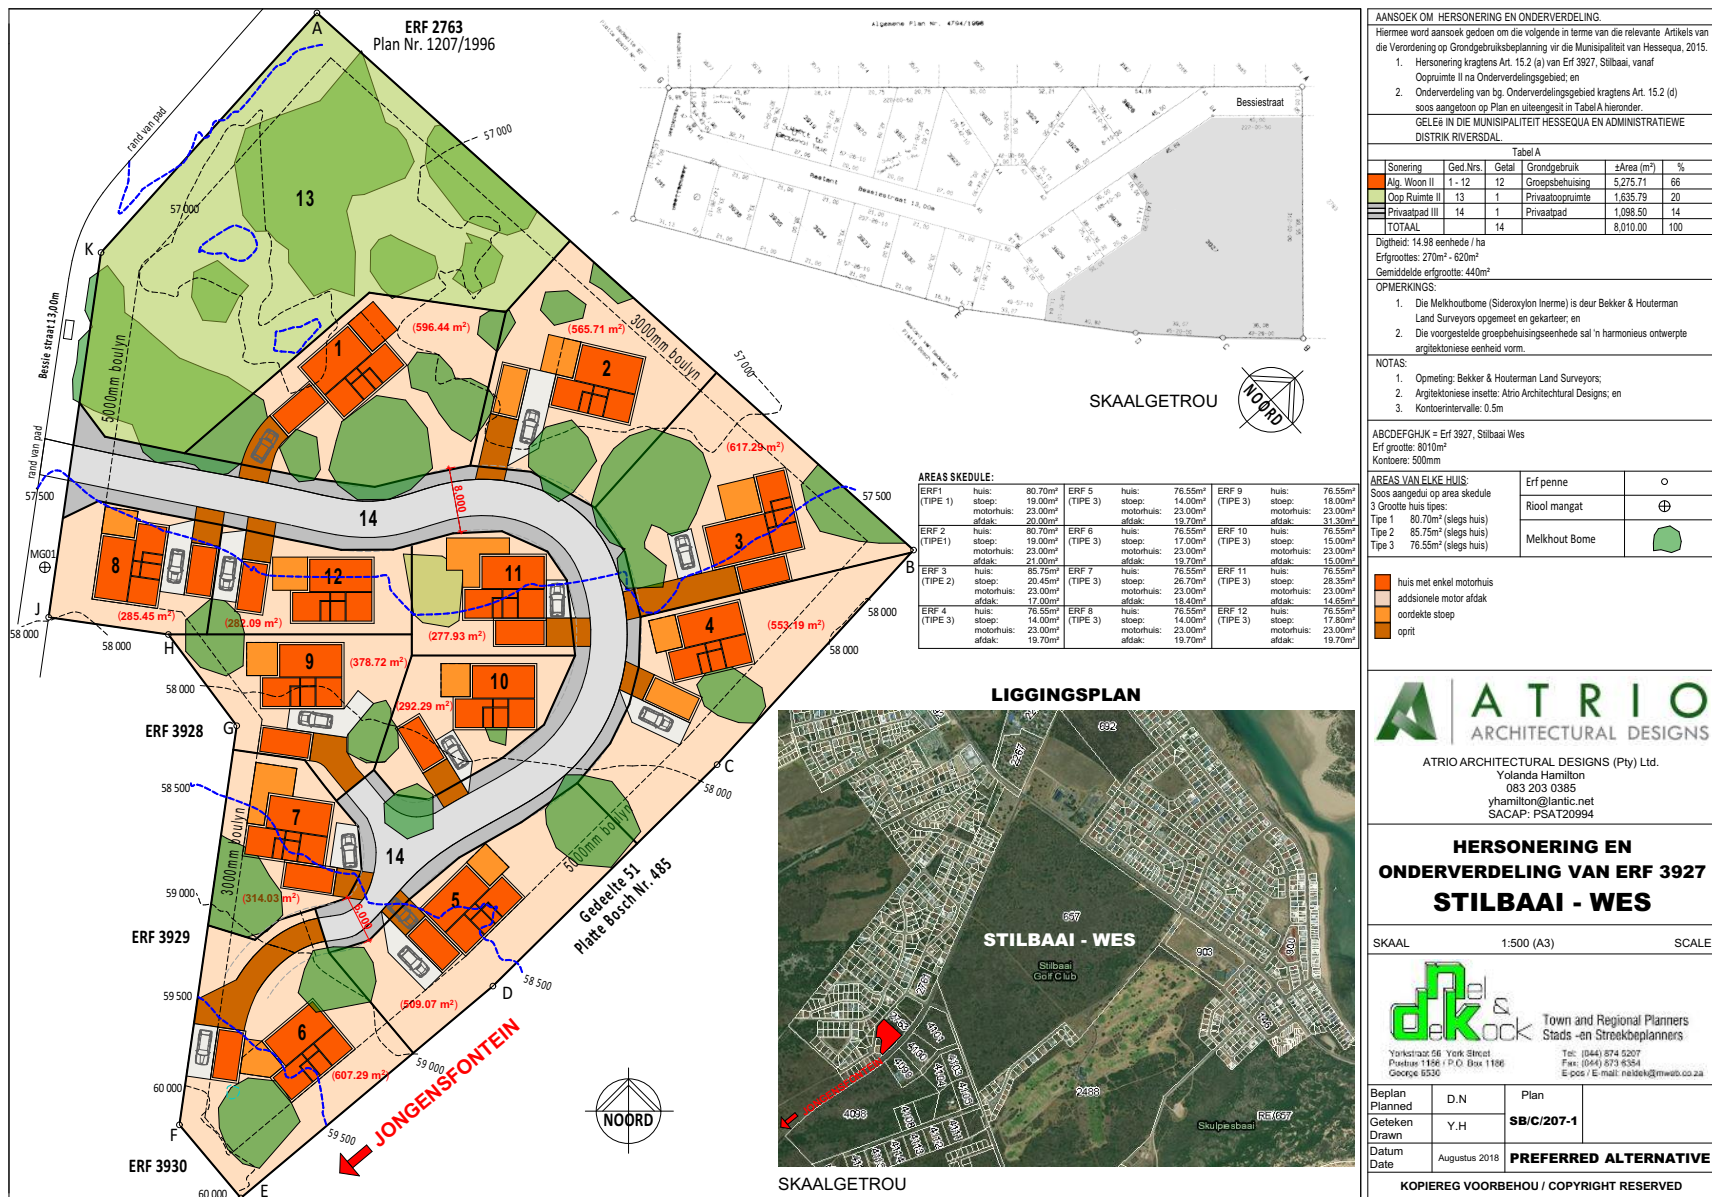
A layout plan of Patrys Development, Erf 3927, Stilbaai West.
